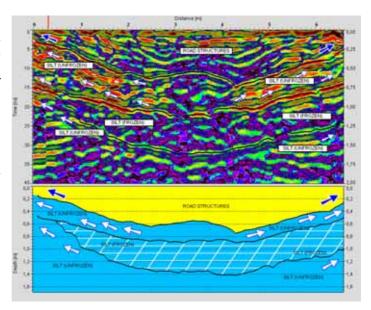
GPR cross section measured at the Kemijärvi test site in May 2004. The GPR profile reveals very wet silty material between the road structure and frozen ground. Reflection structures also indicate plastic flow towards the road shoulders. Wet silty material can also be found under the frozen soil.
